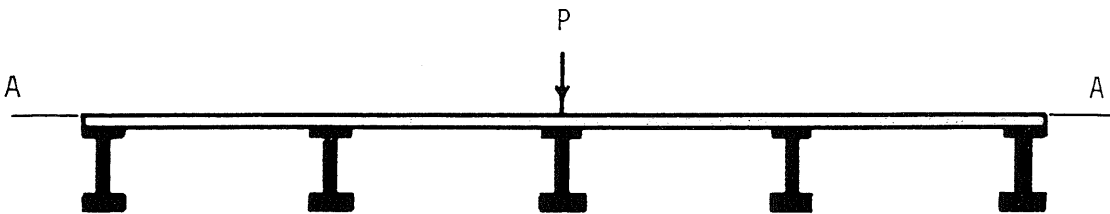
IDEALIZATION OF CROSS SECTION OF PRESTRESSED CONCRETE GIRDERS
